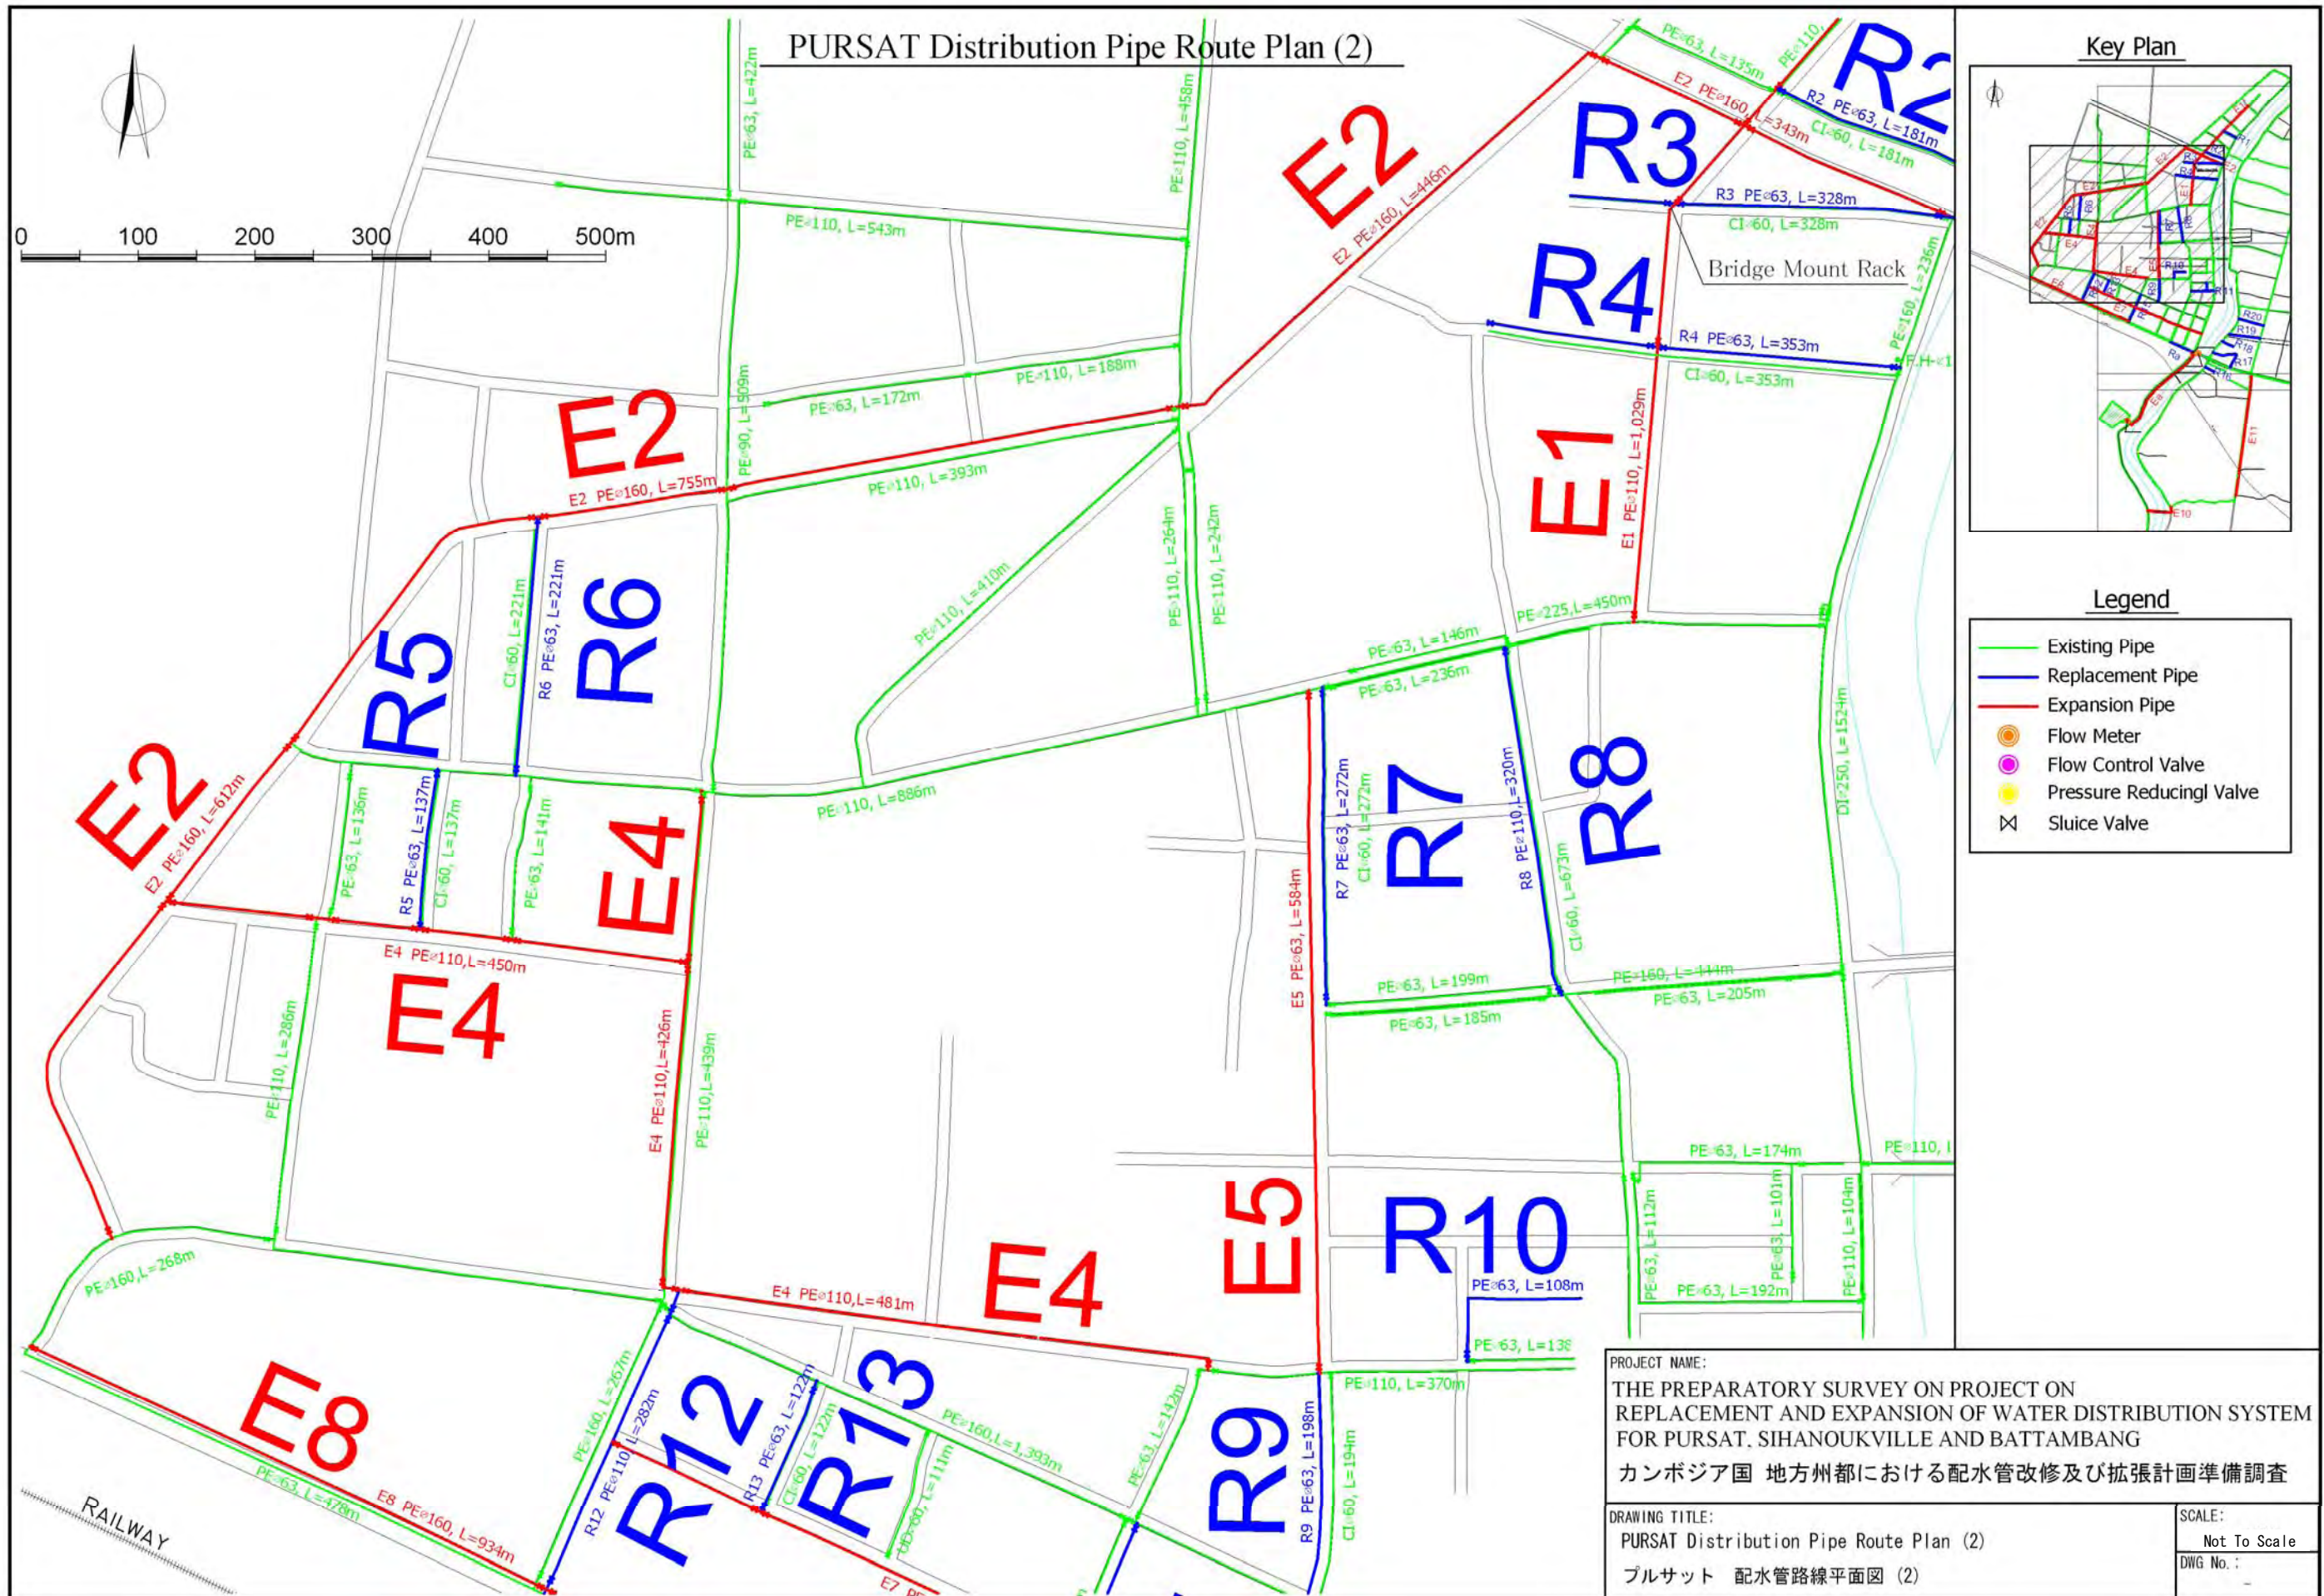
PURSAT Distribution Pipe Route Plan (2)
